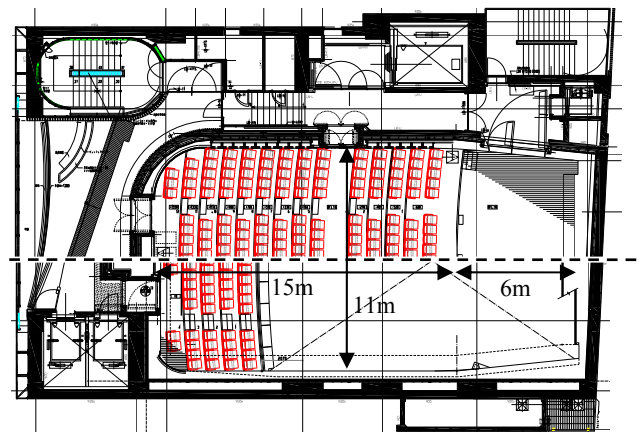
Floor Plan of the First (Above) and Second Tiers (Below)
